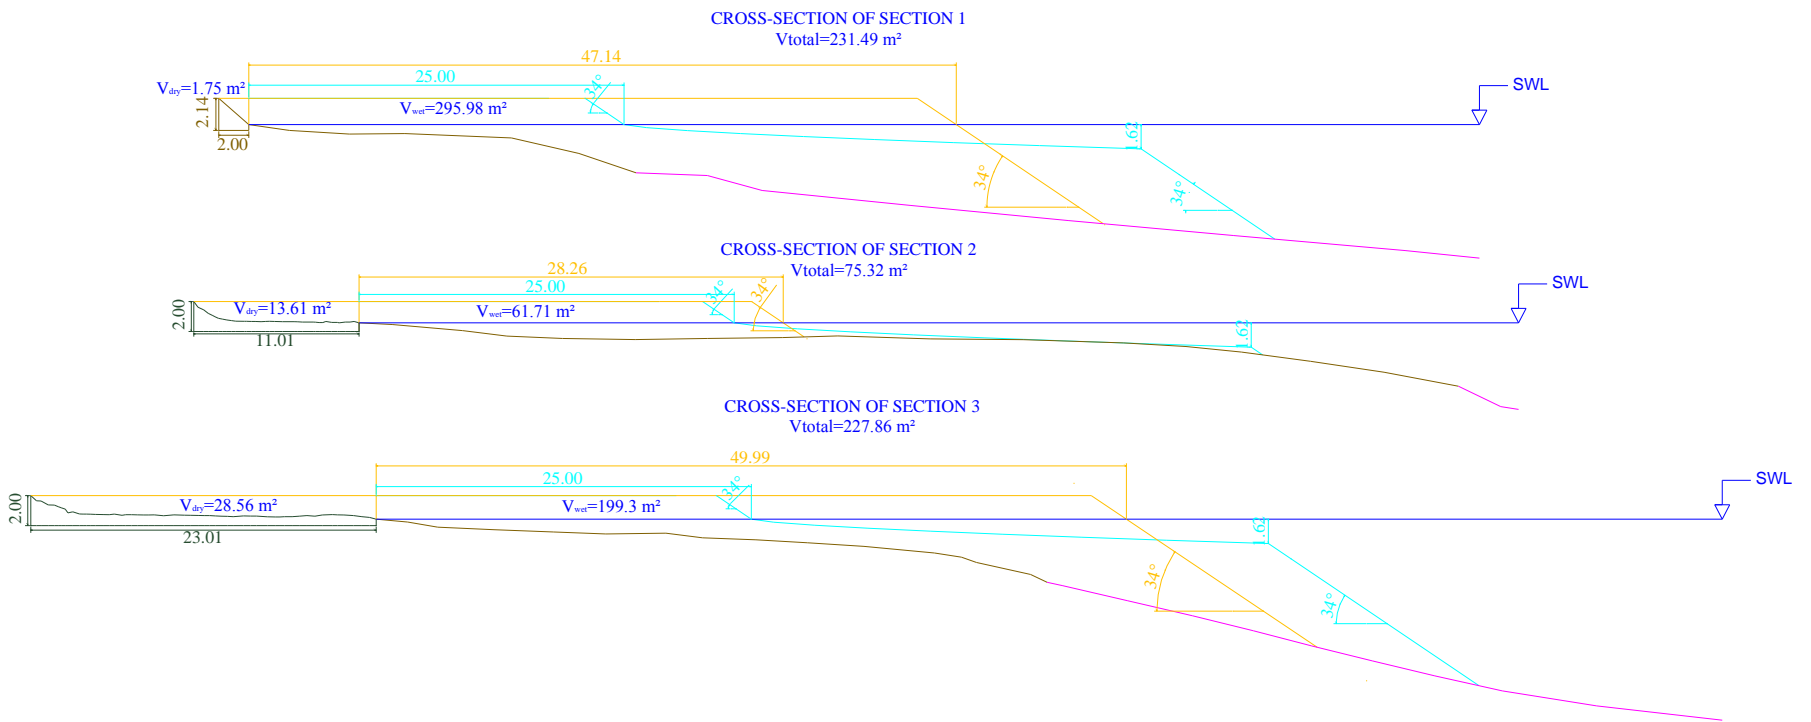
Design profiles of Section 1,2 and 3 for 25 m new dry beach width ($D_{fill}=0.45 \text{ mm}$).
